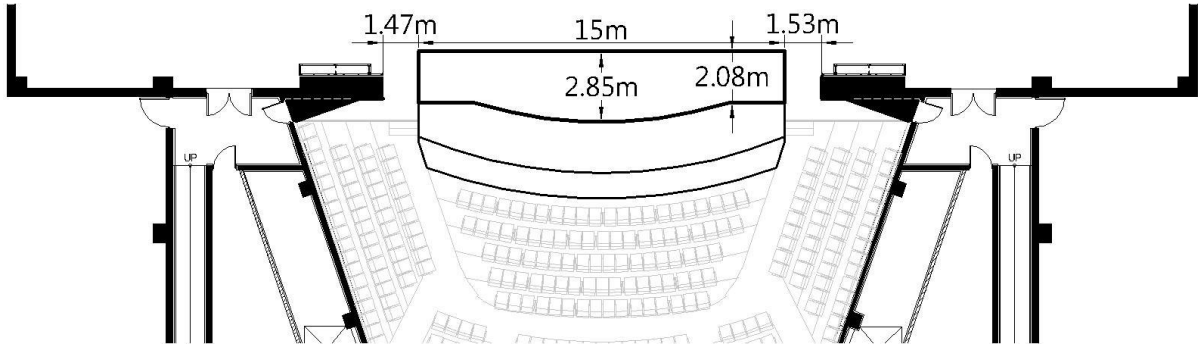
Orchestra Pit Elevation Platform location plan
